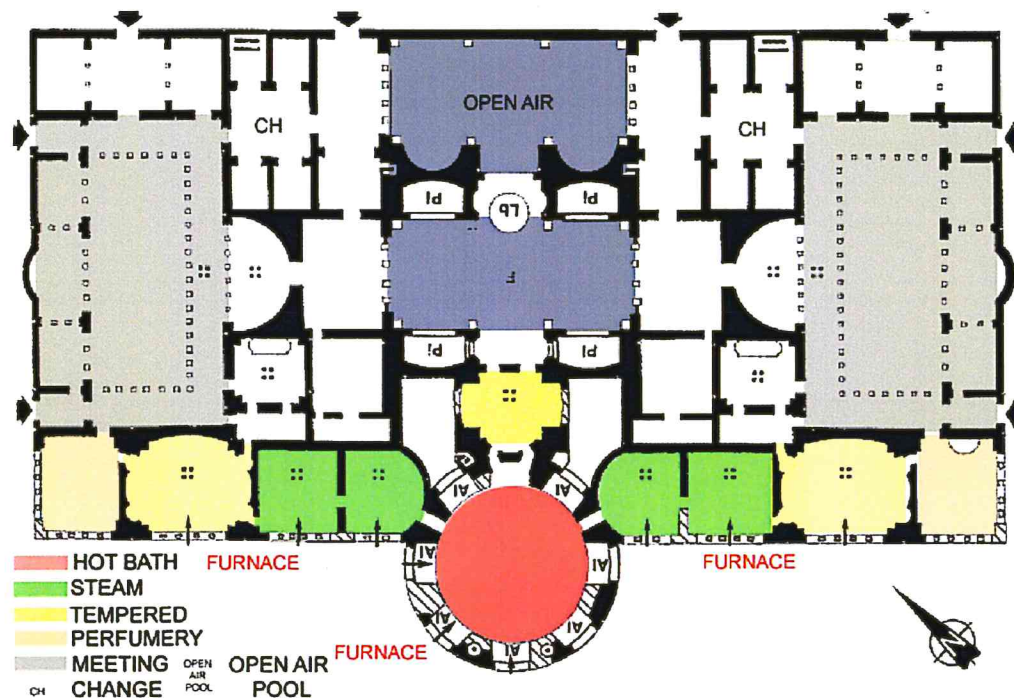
Floor plan of bath showing scale of rooms and functional organization.
